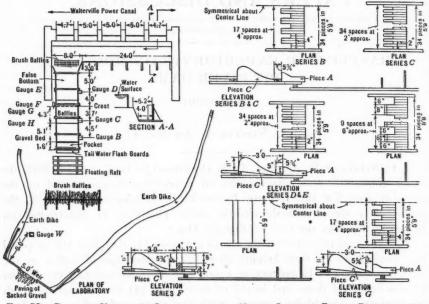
PLAN OF HYDRAULIC LABORATORY AND MODEL, LEABURG POWER DEVELOPMENT.
